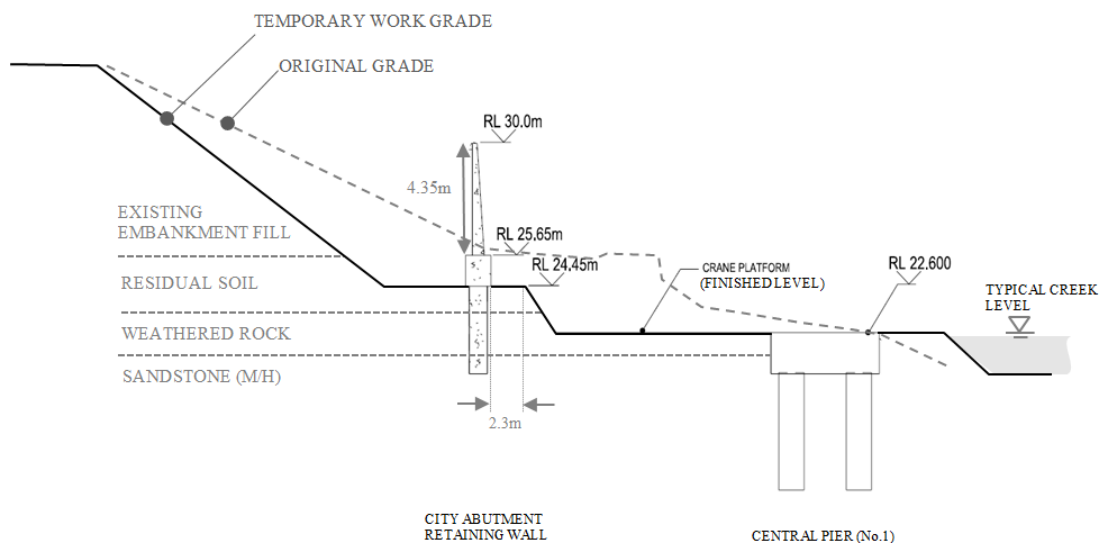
Geometry with the as-constructed crane/ piling platform during early site works
